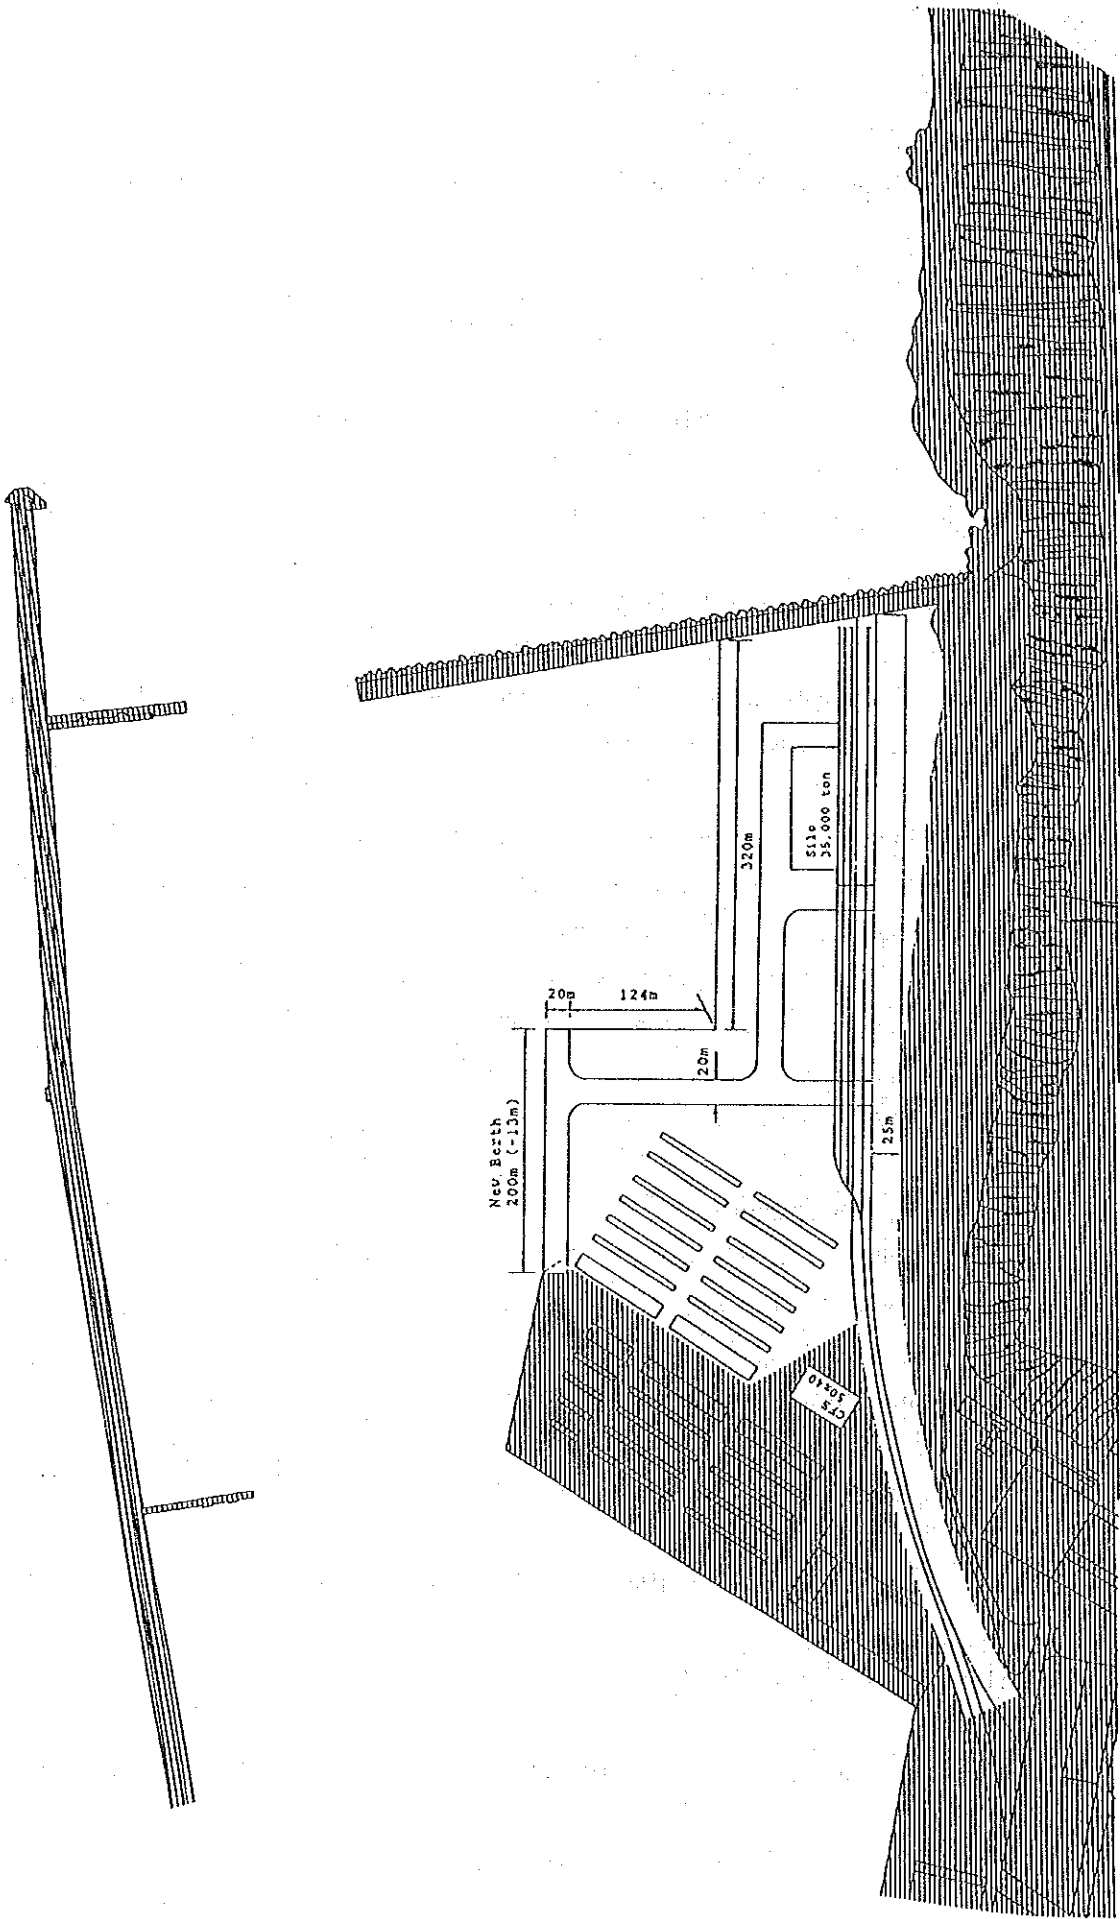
The Layout of the New Facilities in the Short-Term Plan
